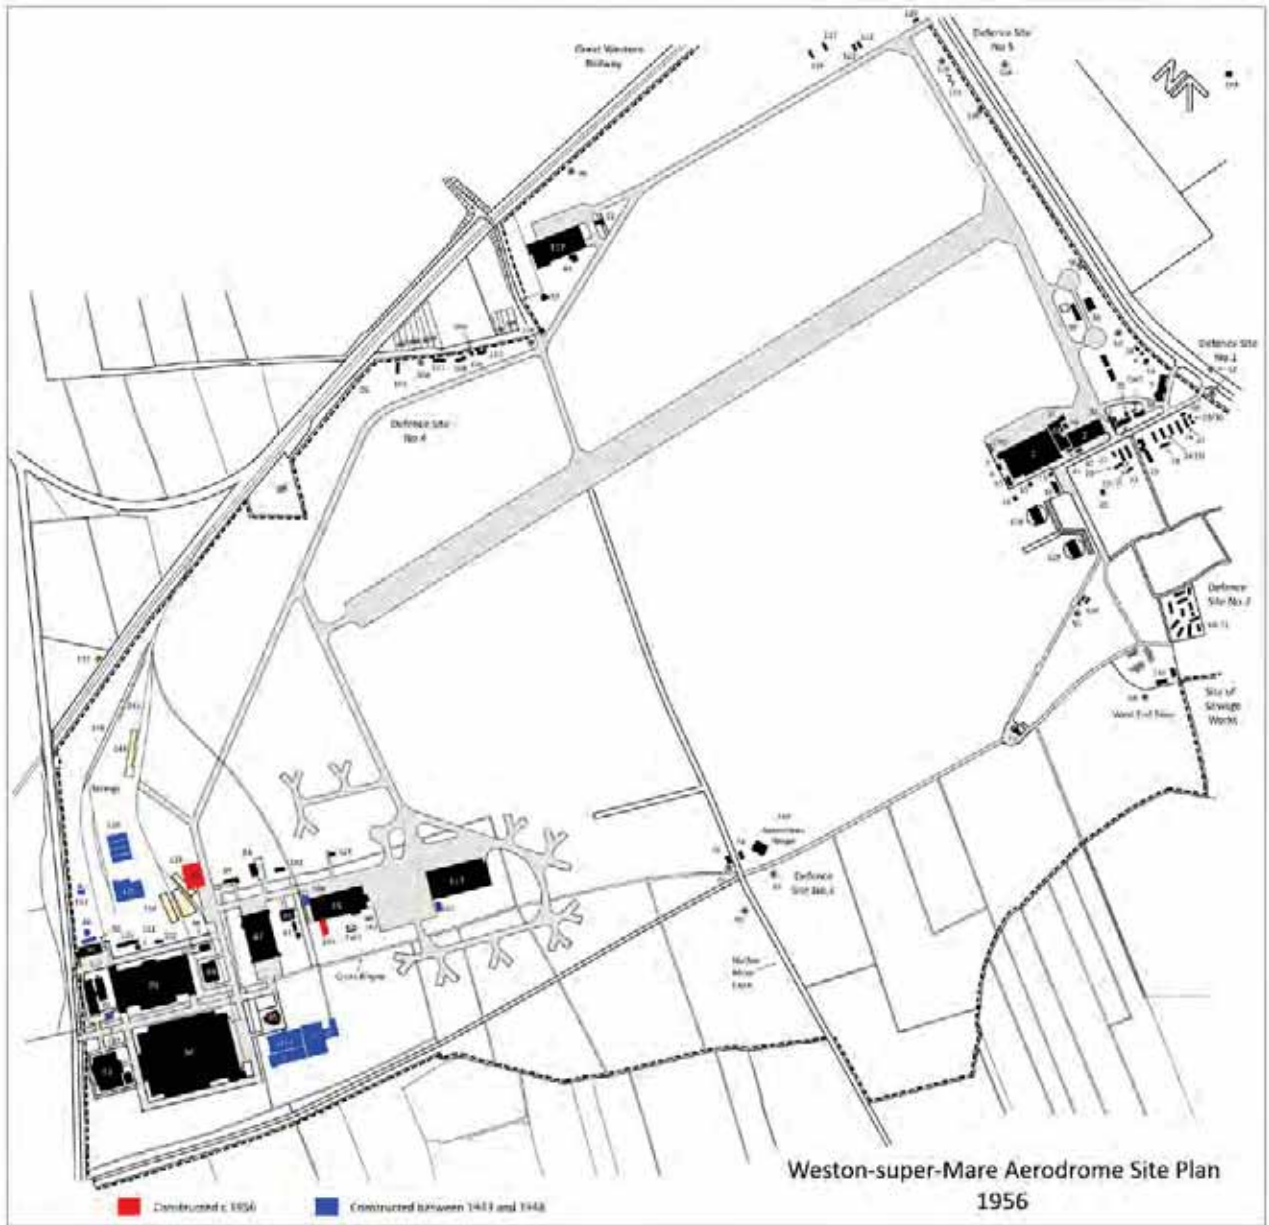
The 1942 layout with buildings constructed between 1943 & 1948 and 1956
